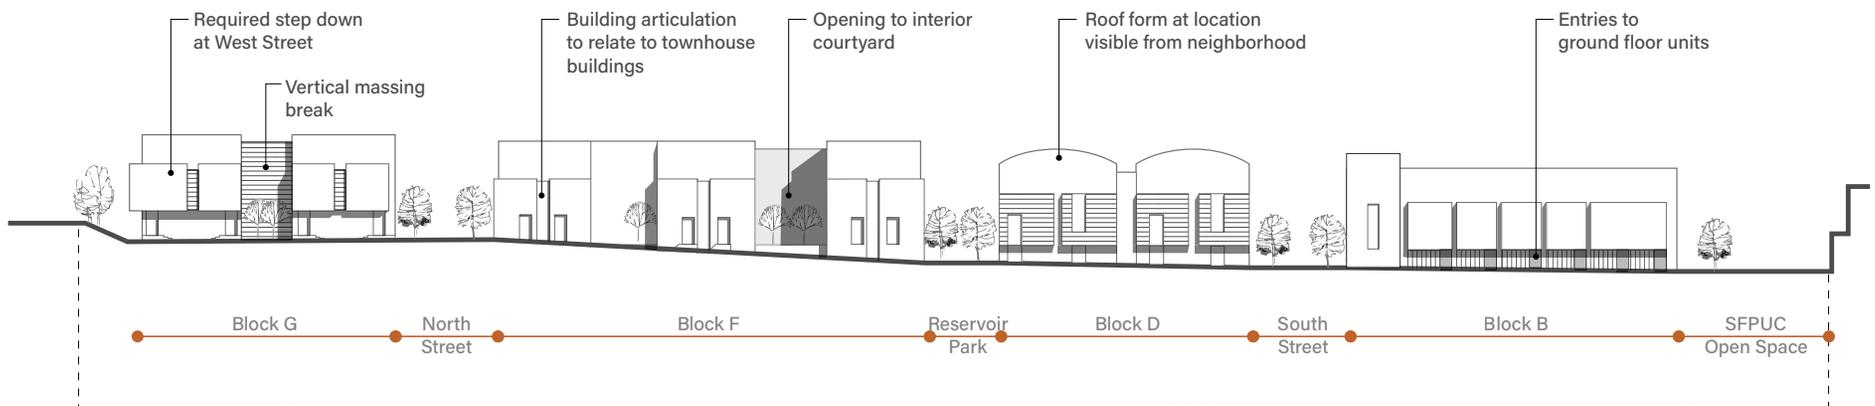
Conceptual Streetwall Character - East Side of West Street
